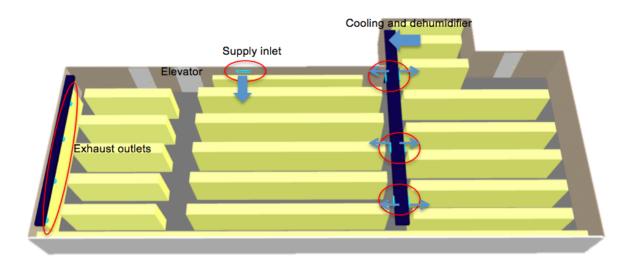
Floor plan of the storage area including an illustration of the climate system
